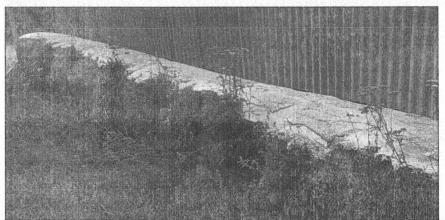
Tyre wall adjoining Letts Gully Road taken immediately east of the entrance to the property. Showing the partially clad lower section of wall topped by weathered corrugated steel fence. (O. McIntosh 15/03/23).
